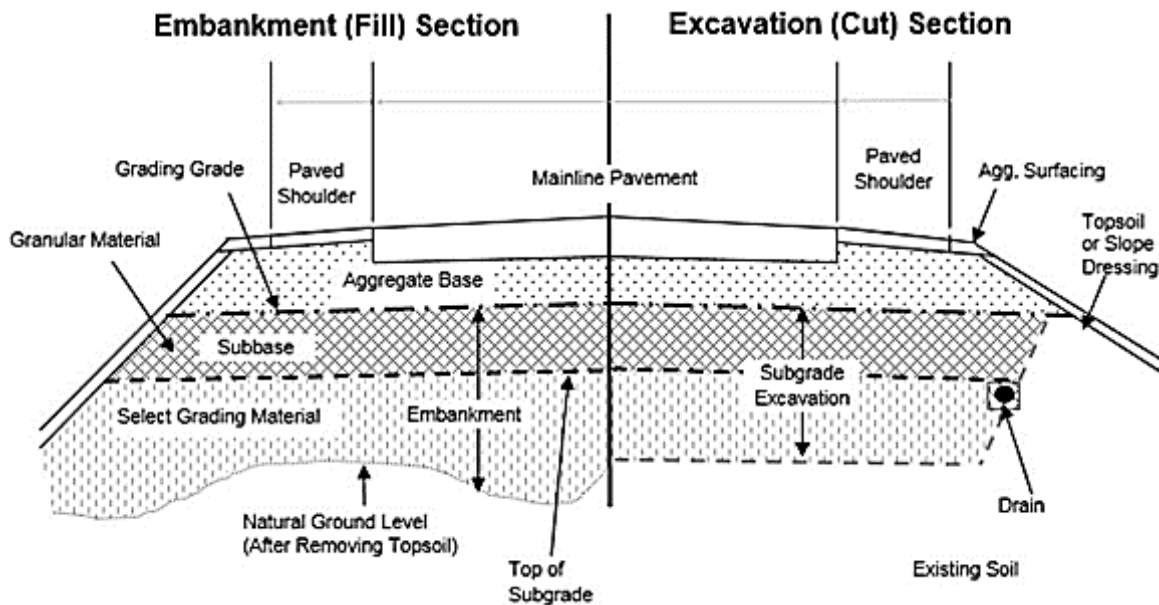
An Ideal Pavement Section (from <http://www.dot.state.mn.us/materials/pvmtdesign/manual.html>)
